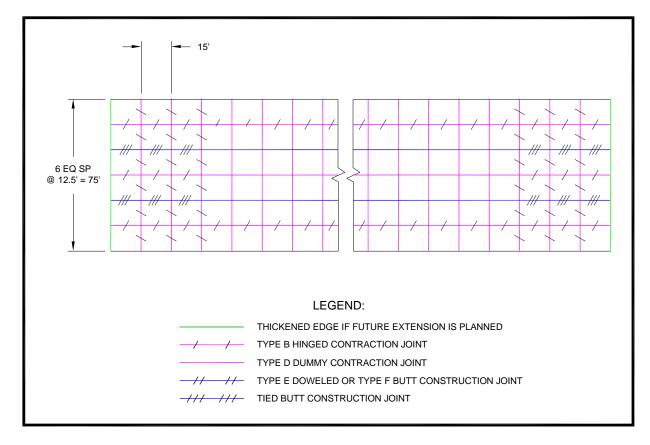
Typical Joint Layout Pattern for Runway, Parallel Taxiway and Connector
